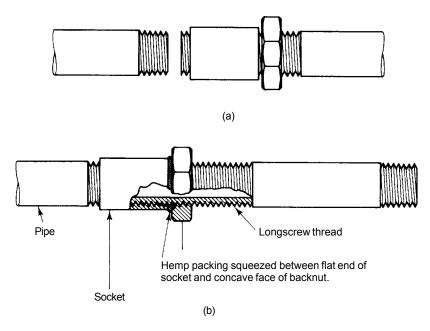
Longscrew with coupler and backnut: (a) joint ready for connection; (b) joint made
